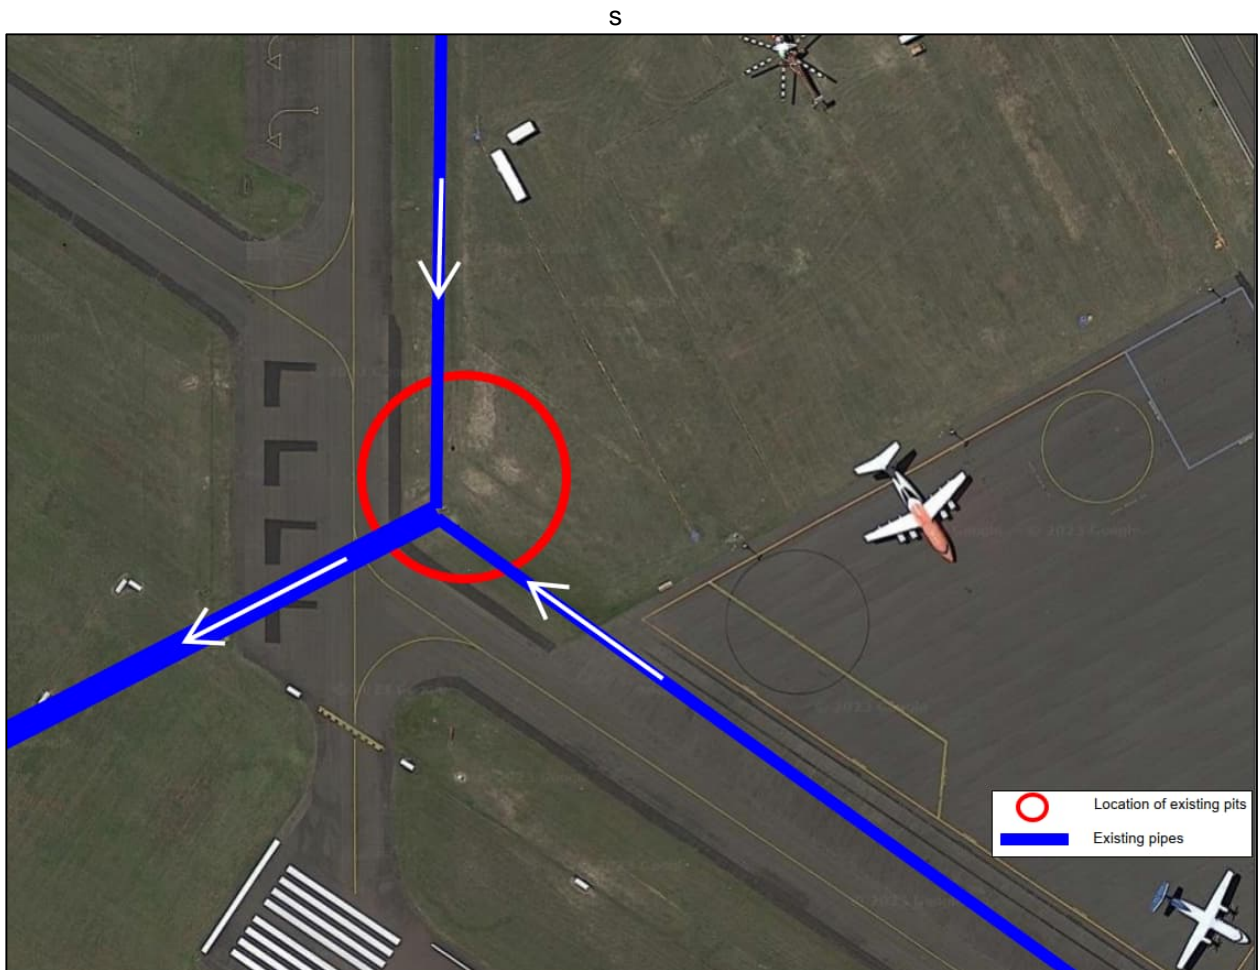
Aerial image of existing pits within the Project site and indicative drainage pipes
